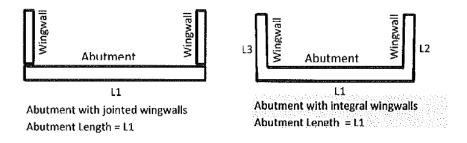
Reinforced Concrete Abutment Walls & Wingwalls
